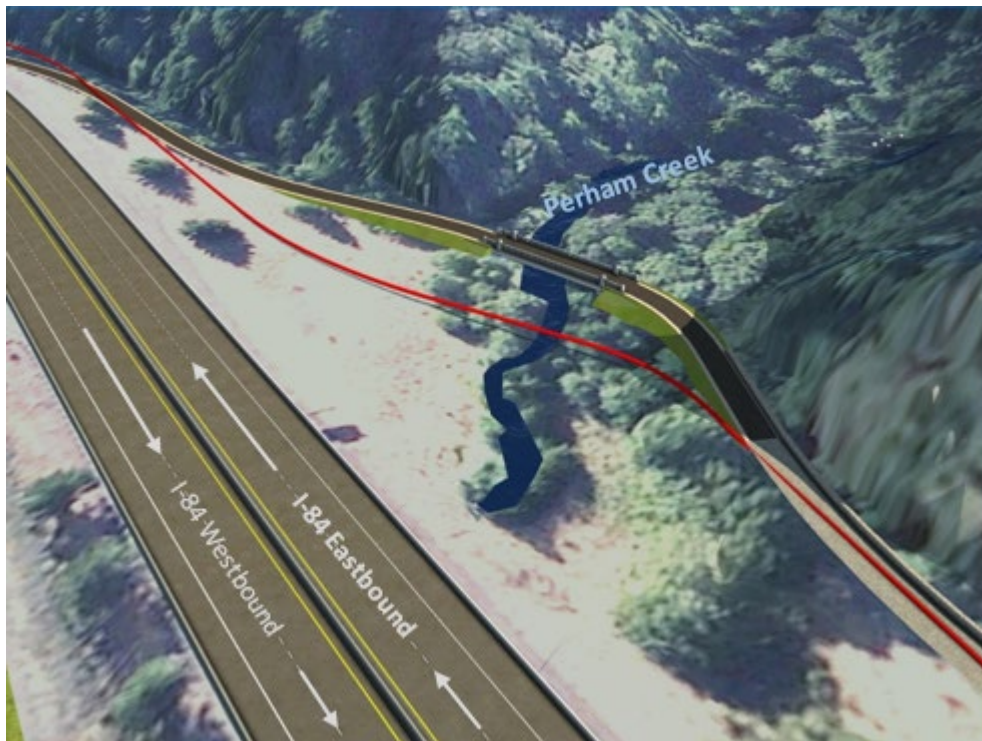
Trail Refinement at Perham Creek Bridge (STA 390+00) with alternative alignment consider shown in red.
